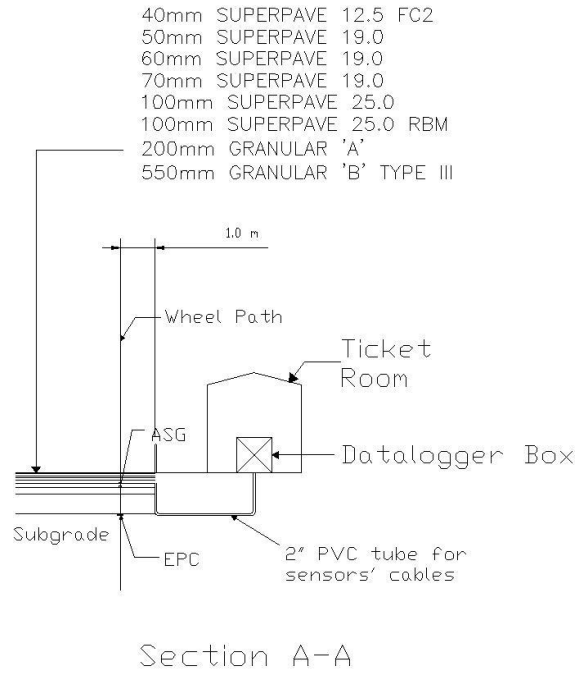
Transverse Cross-Section of the Guelph Test Section
